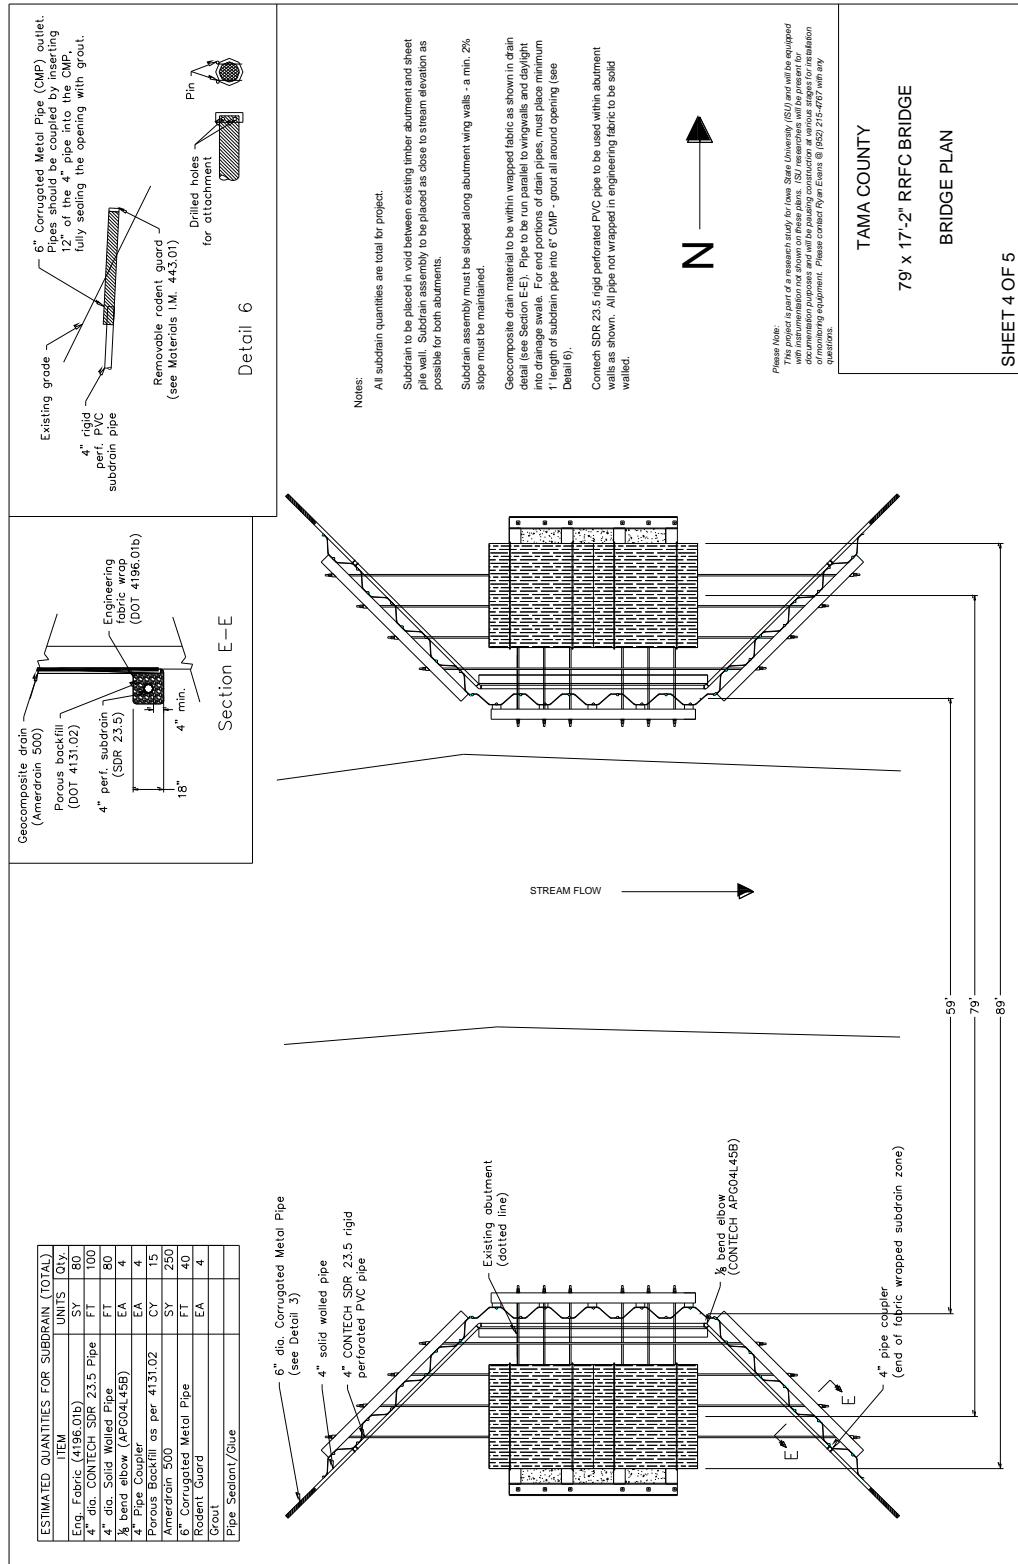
Situation plan and drainage system details for demonstration project in TC, Iowa
